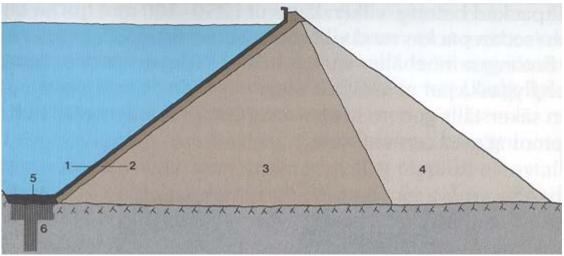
A typical stone fill dam with a face slab (Vattenfall 1988).
